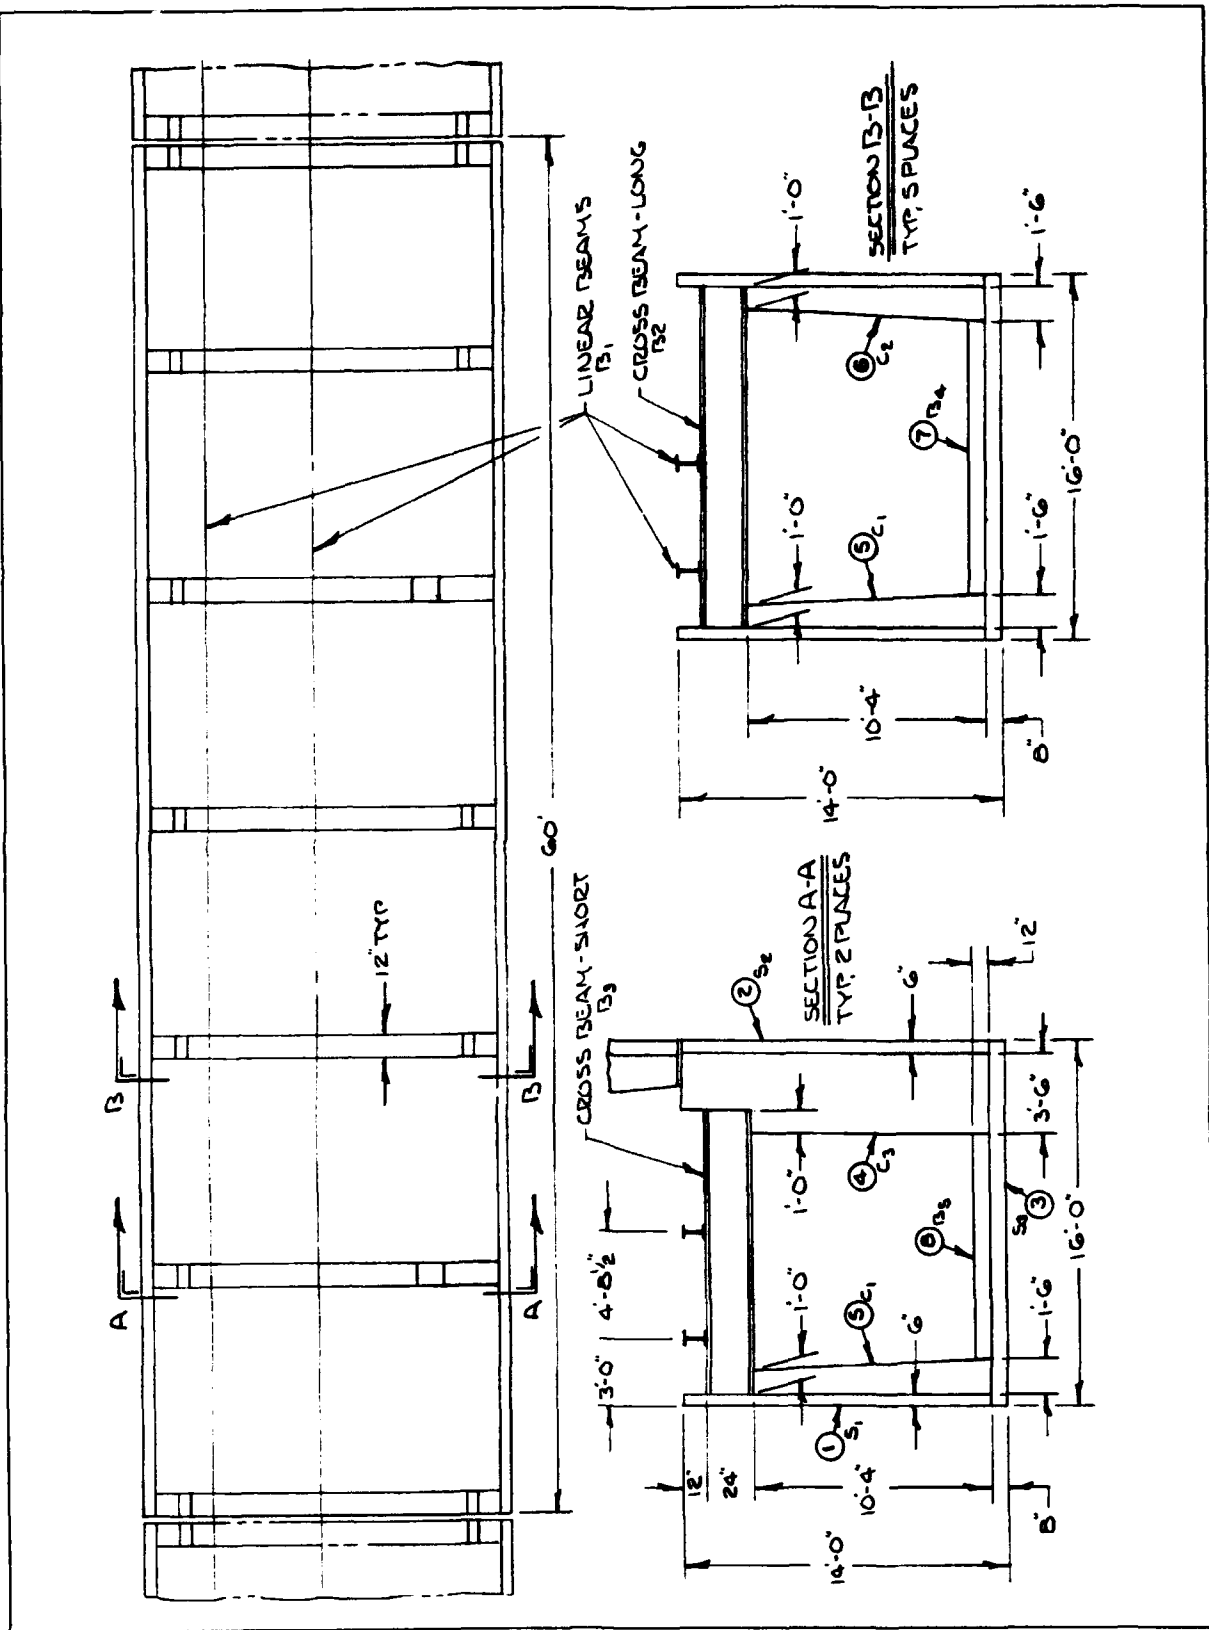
PLAN AND TWO CROSS-SECTIONS OF THE FOUNDATION
